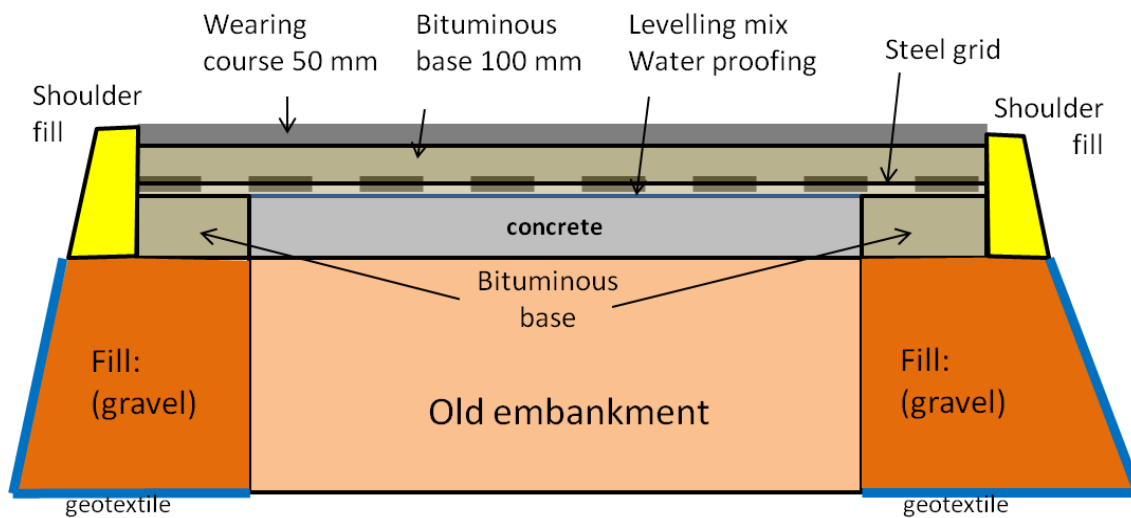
4. A schematic illustration of the strengthening and widening structure. Plumer modified bitumen was used in the waterproofing and levelling mix.
